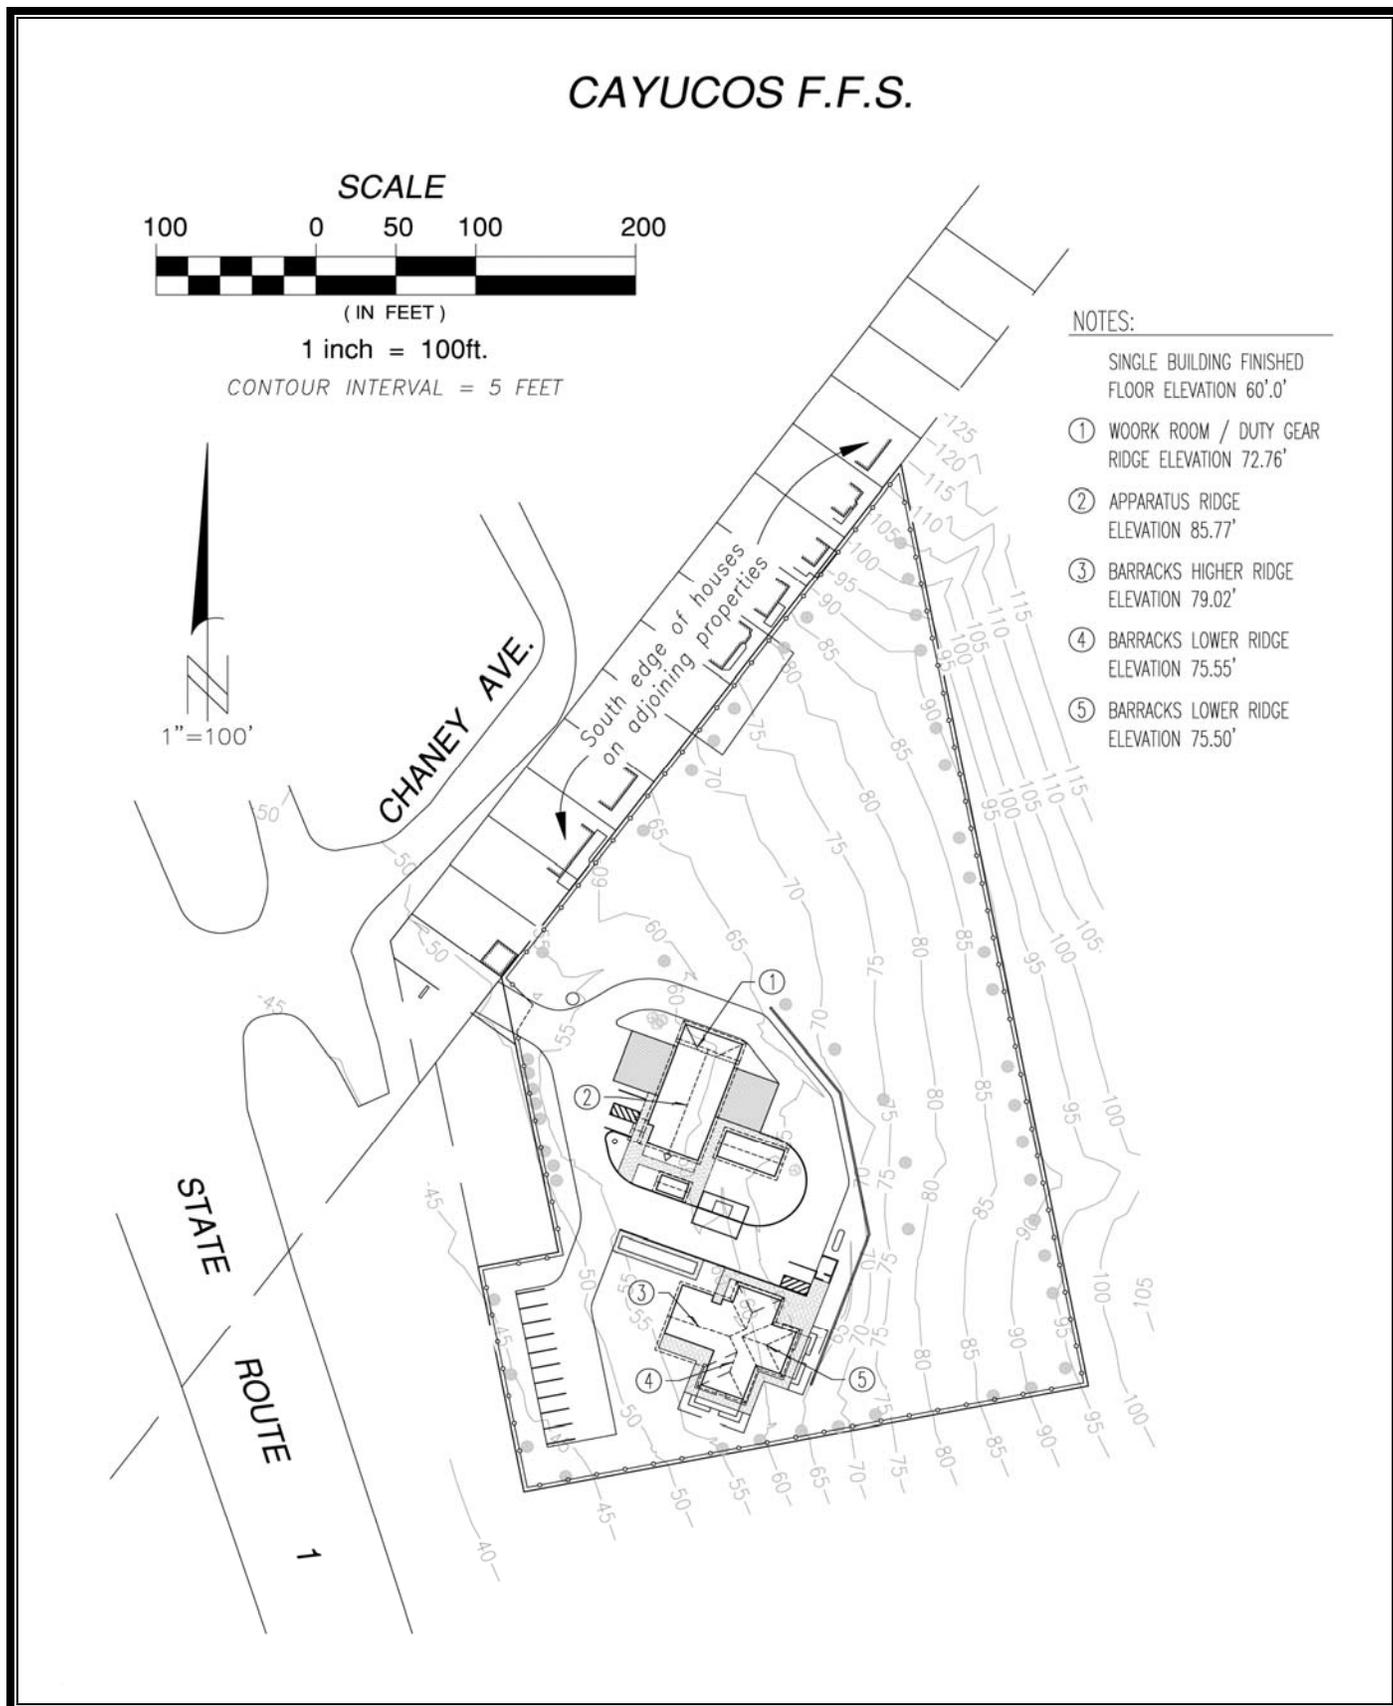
Site Sketch (pending final design) – New apparatus & barracks building ridge heights.
